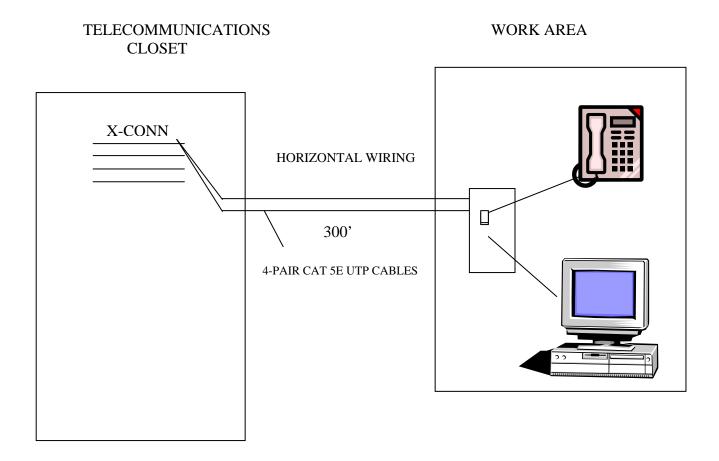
Typical Horizontal and Work Area Wiring
